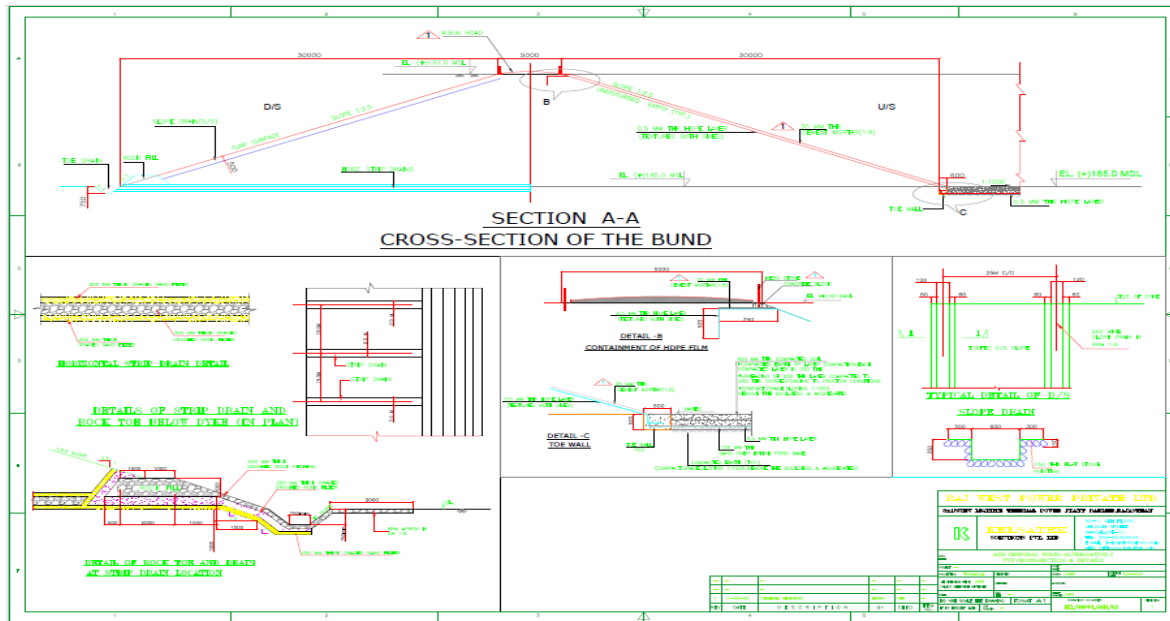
ASH DISPOSAL POND- CROSS SECTION AND DETAILS
